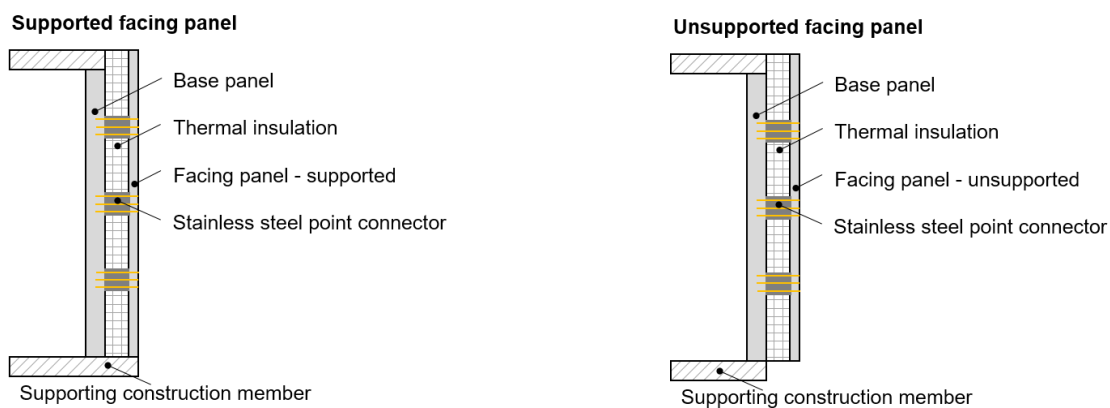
Supported and non-supported sandwich wall, assembled with stainless-steel point connectors; without gap between thermal insulation layer and base panel
